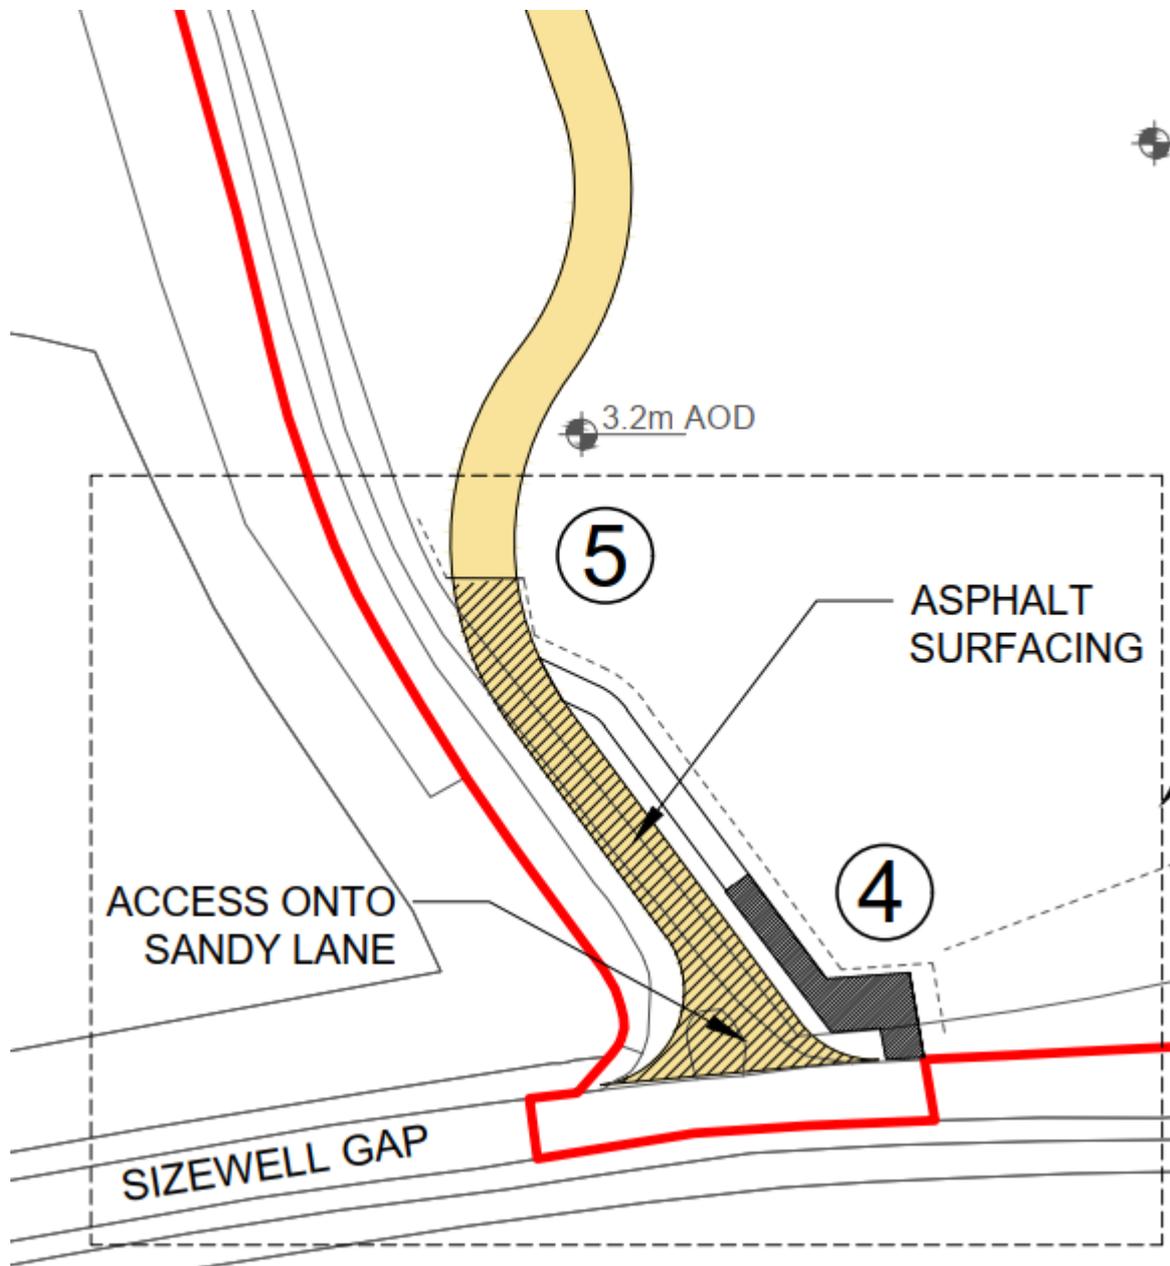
Sizewell Gap / Sandy Lane Road Junction and Route of Outage Car Park Access Track
